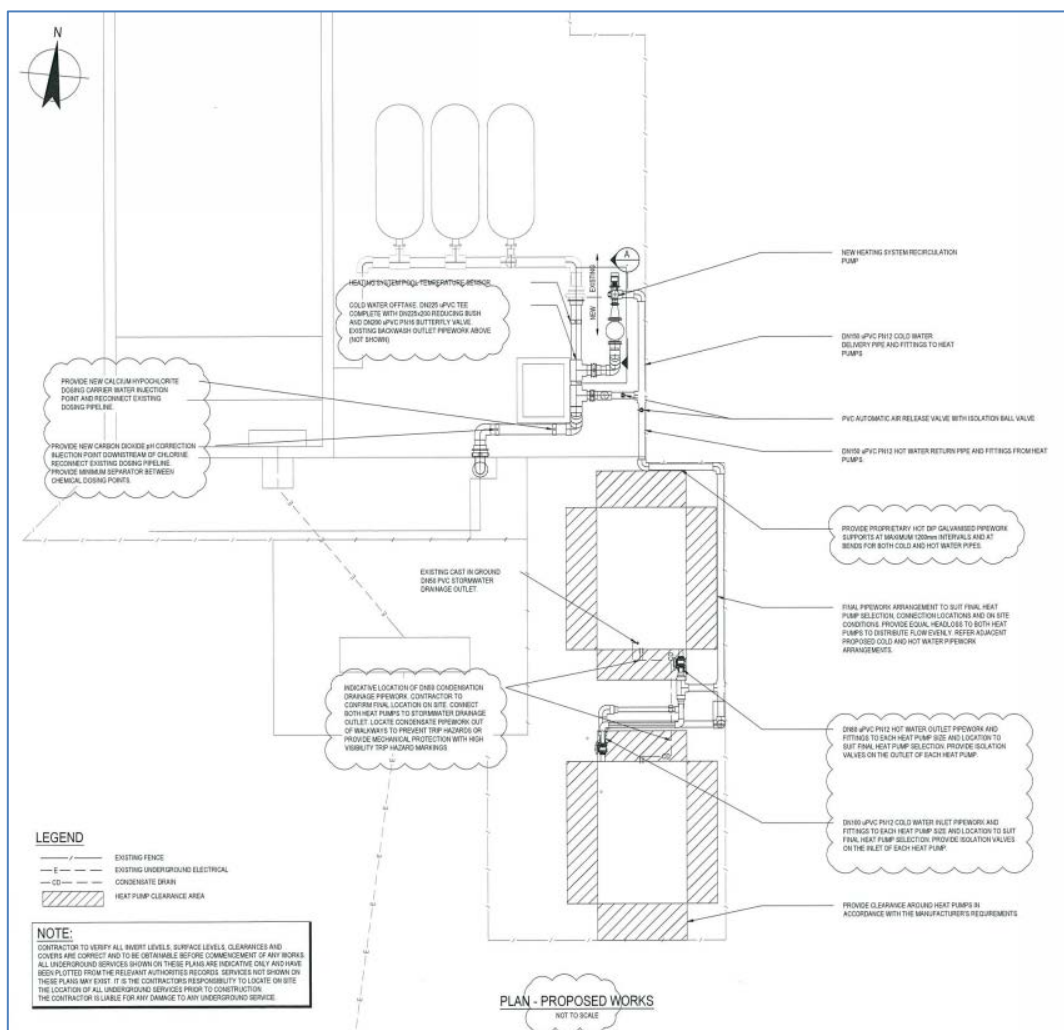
Ferny Hills Swimming Pool - 50m Pool Heat Pumps Replacement Proposed Plan
